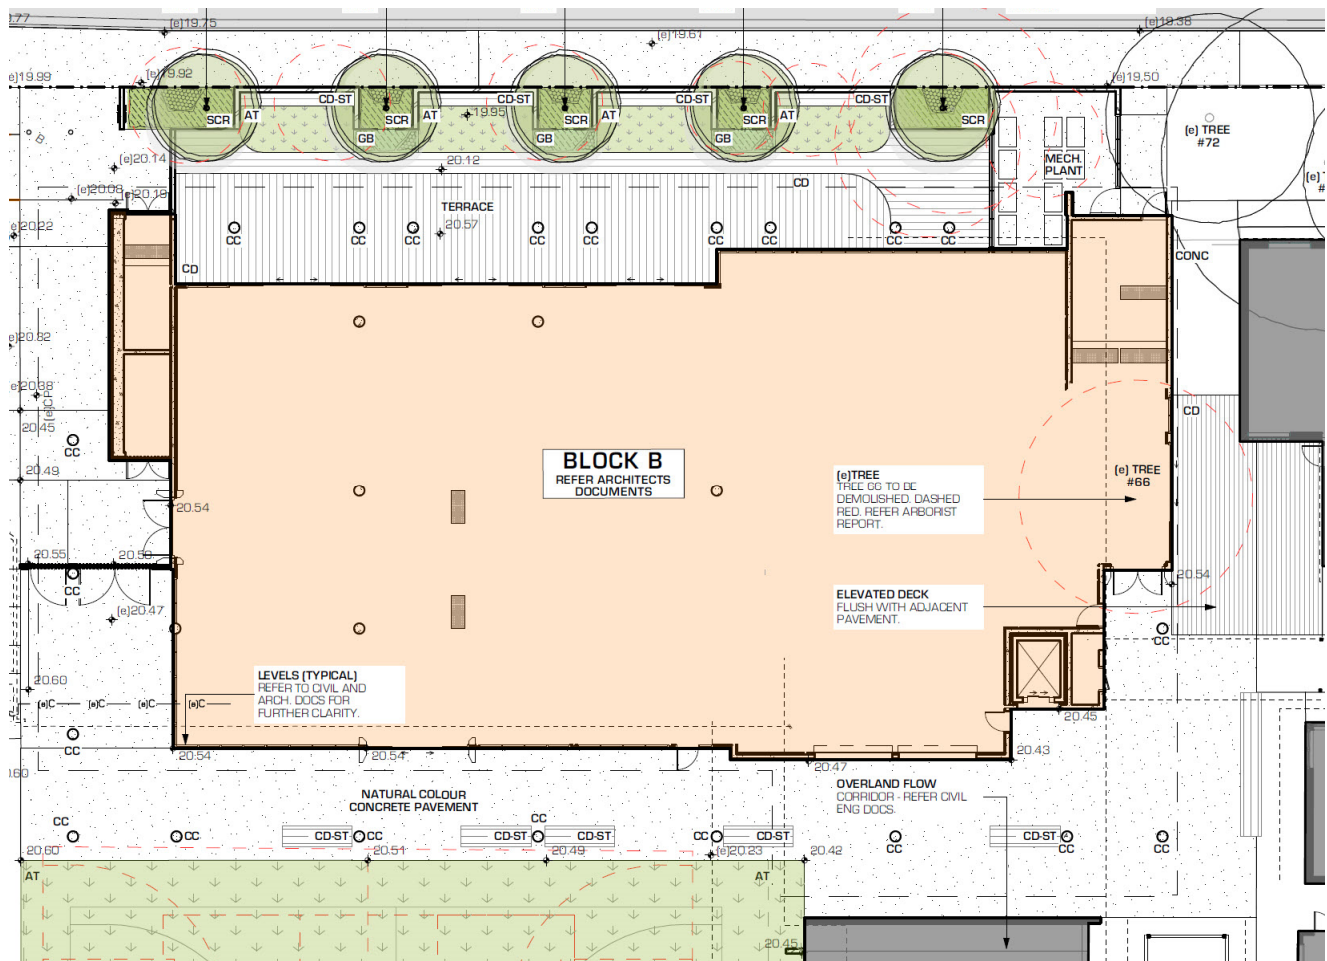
Landscape Plan: Ground Floor Block B (Source: OHD Landscape Architects, DA2800)
